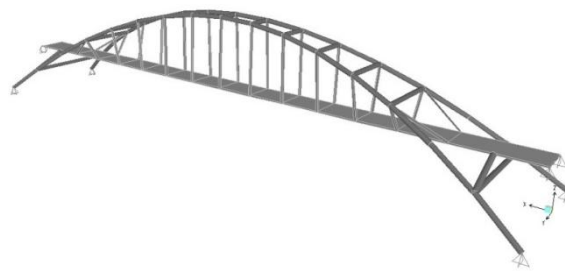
Complete model of the pedestrian bridge showing the major structural members
